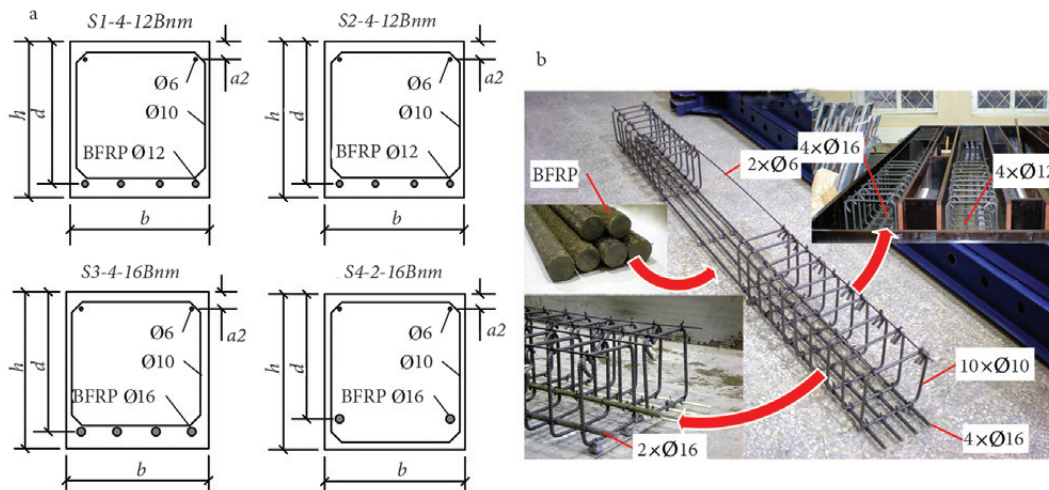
Reinforcement schemes of the beams: a – cross-sections of the beams; b – preparation for casting
